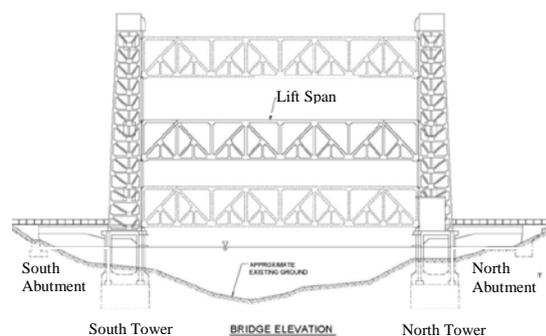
Fruitvale Railroad Bridge, Elevation View
